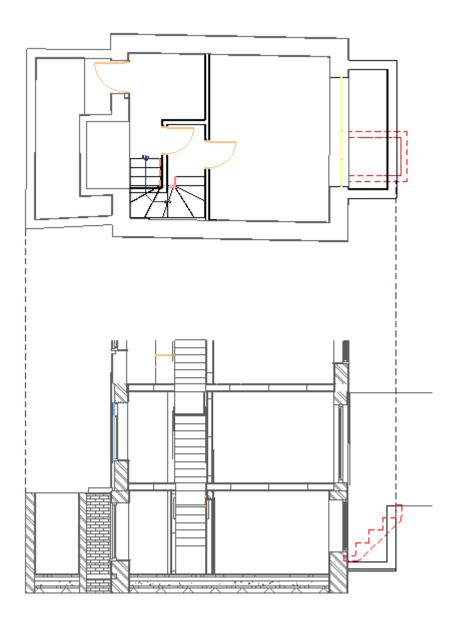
Proposed Lightwell/Basement Floor Plan and Section
